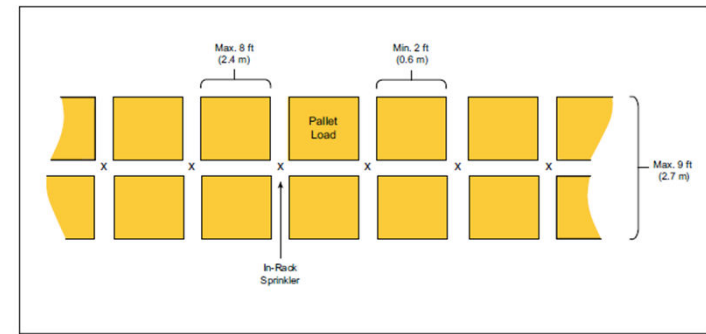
Plan view of IRAS(E) horizontal in-rack sprinkler arrangement for double-row racks having a maximum depth of 9 ft (2.7 m)
